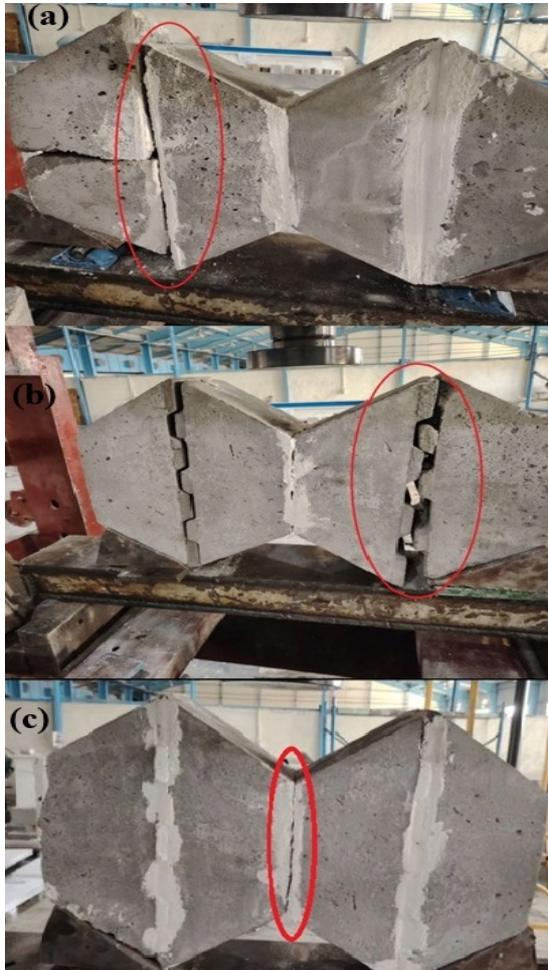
Failure modes of stacked hexagonal blocks (a) without interlocking and using M2 joint materials, (b) with interlocking and not using a joint material, (c) with interlocking and using M2 joint material.
